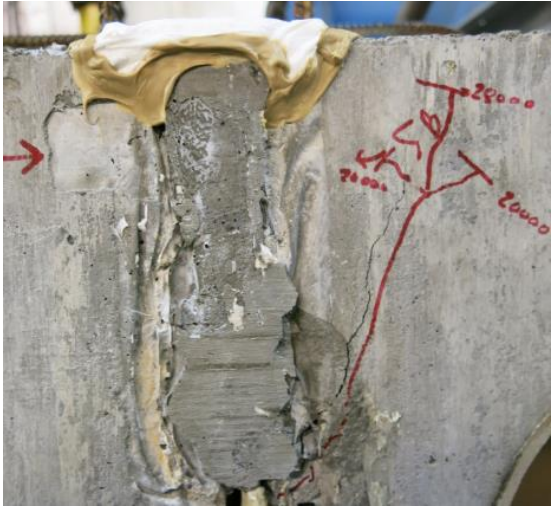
South joint showing the crack behavior during the final static test of specimen 4
